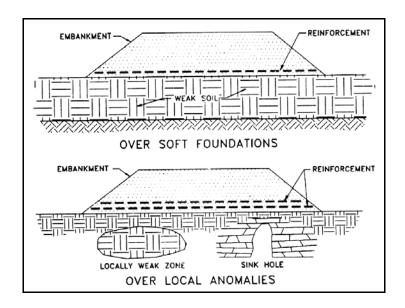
Reinforced Embankment Over Weak Foundation Soils (Holtz et al., 1998).
